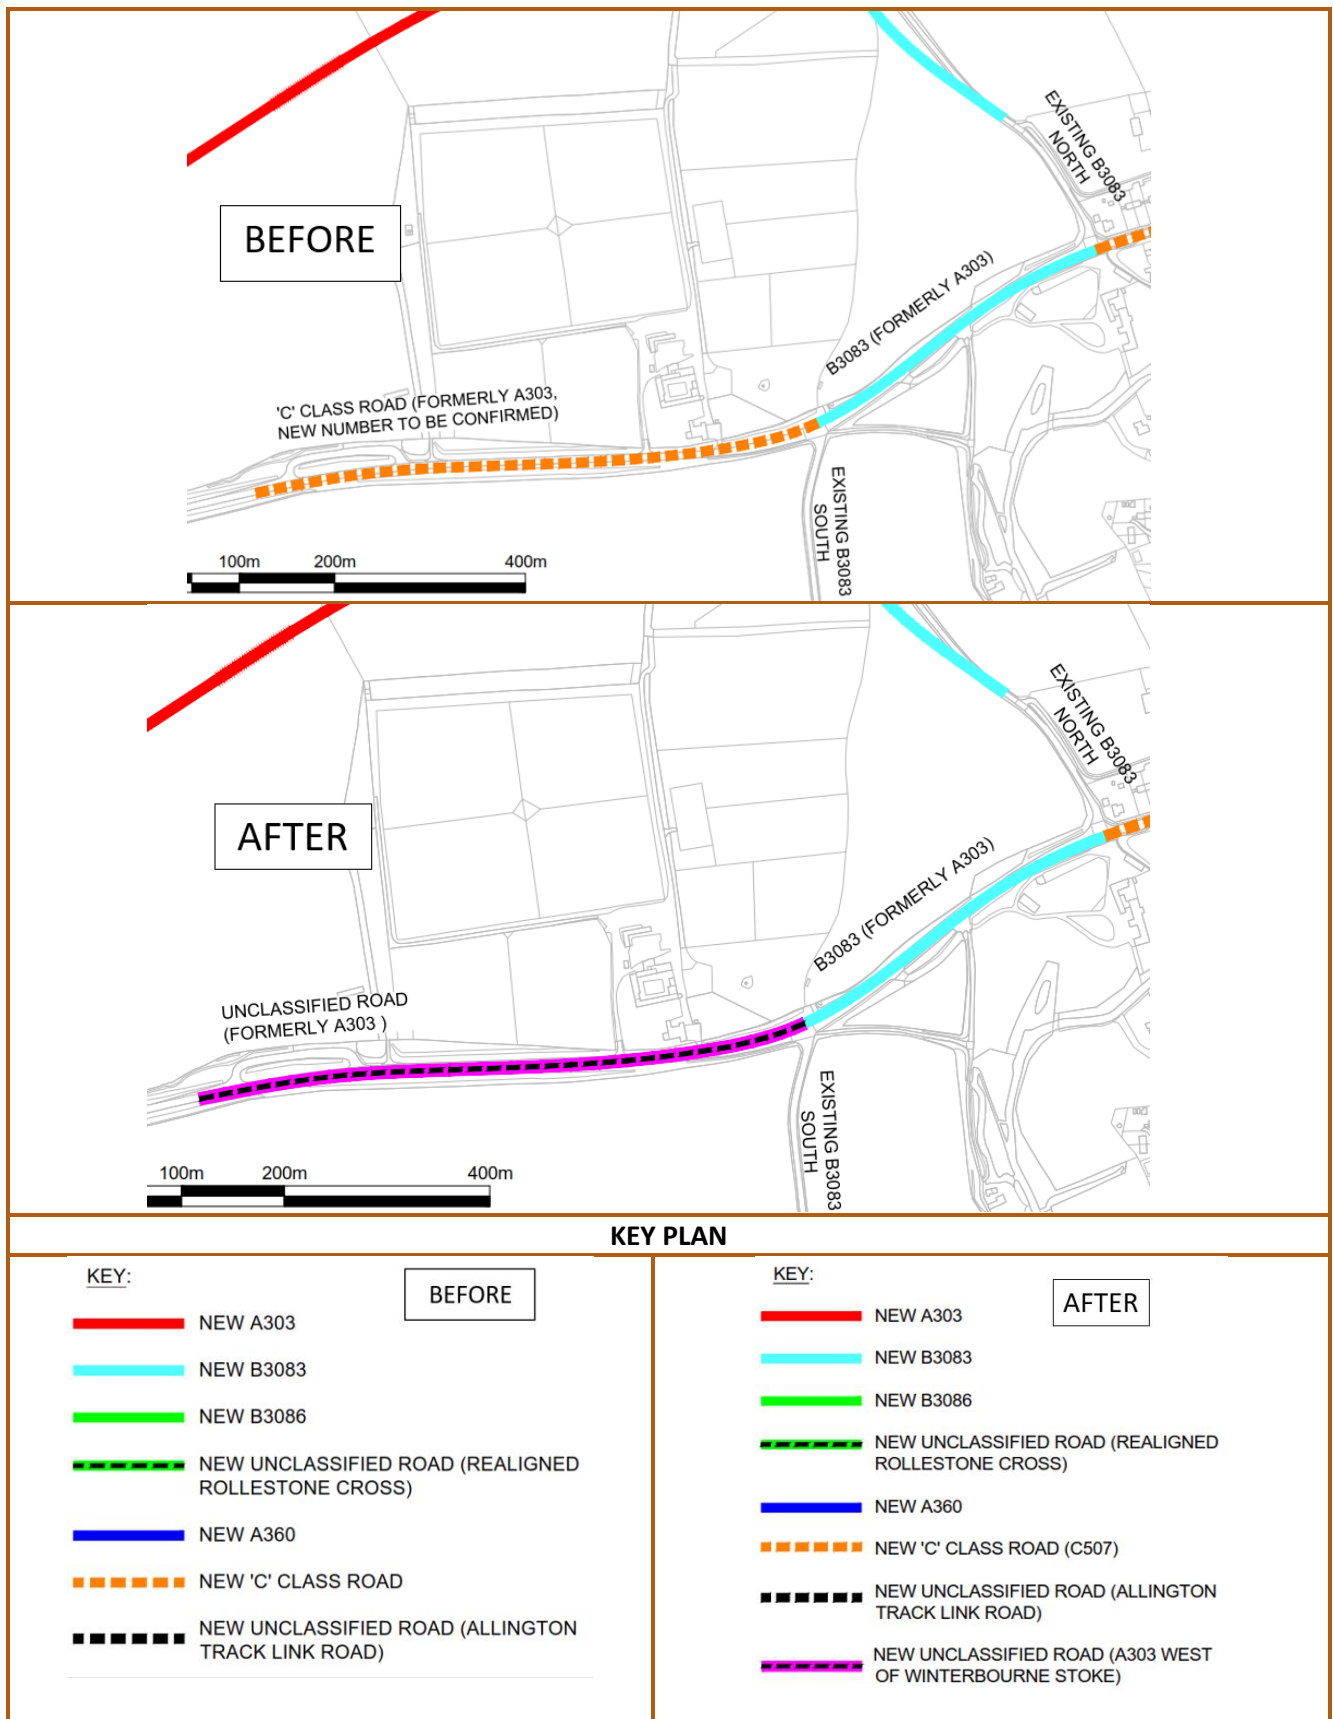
Extract from the Classification of Roads Plan [APP-016]
